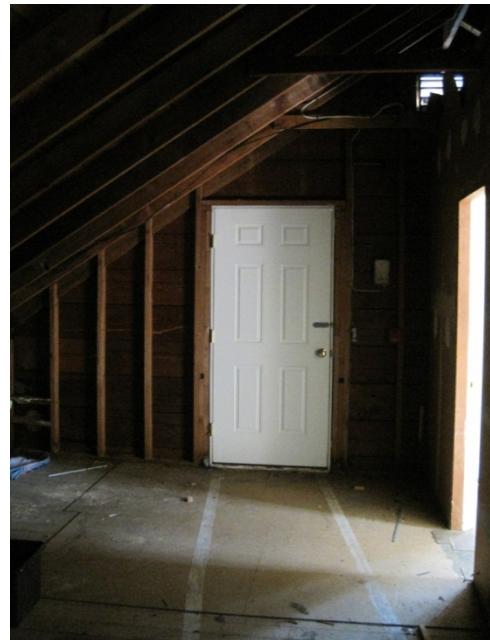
Modern pressed-metal exterior door for egress from the semi-finished attic apartment.
